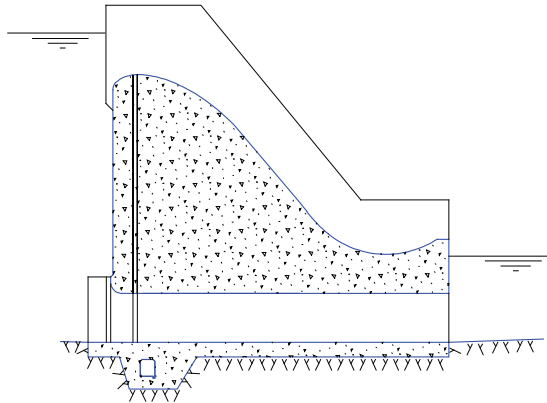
Typical cross-section of an ungated surface spillway with a high ogee crest.
